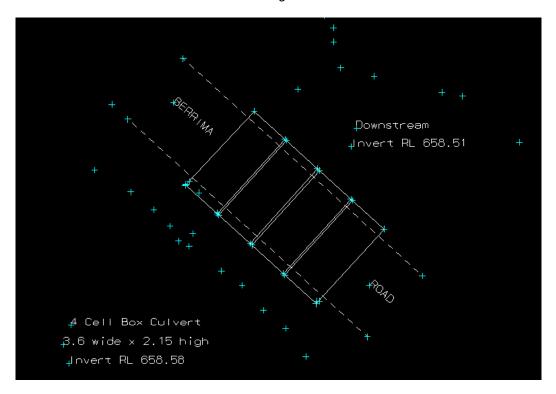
Cad drawing of culvert structure under Berrima Road
